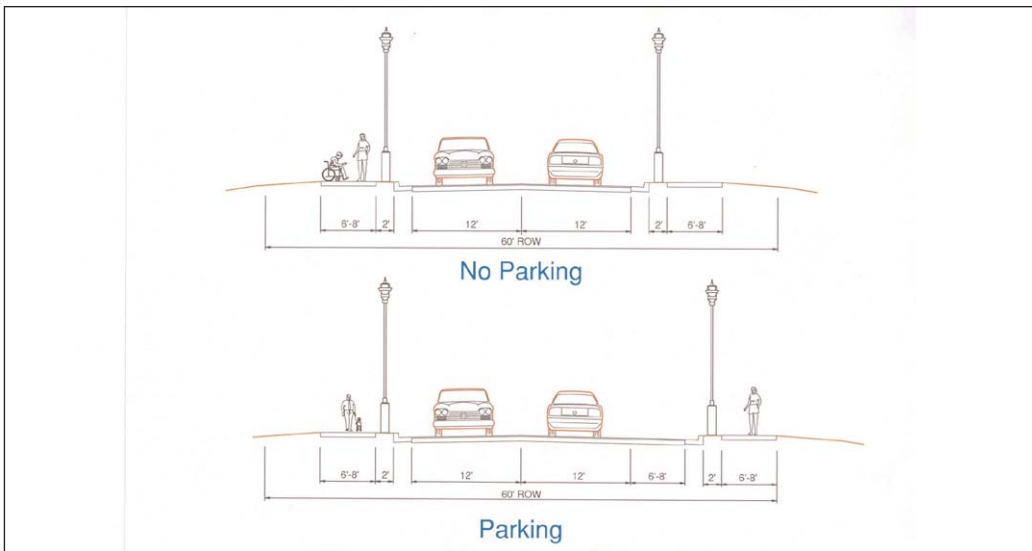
Typical Street Cross-Section - Countryside/Suburban District
